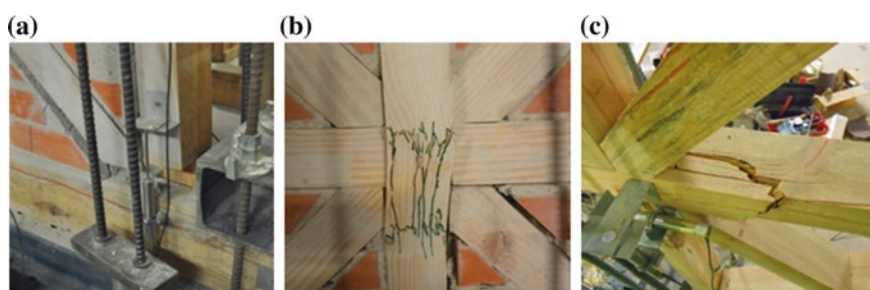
Typical damages in walls: a uplifting of bottom connections in infill wall; b crushing of central connection in infill wall; c tearing off of half-lap joint in timber frame
